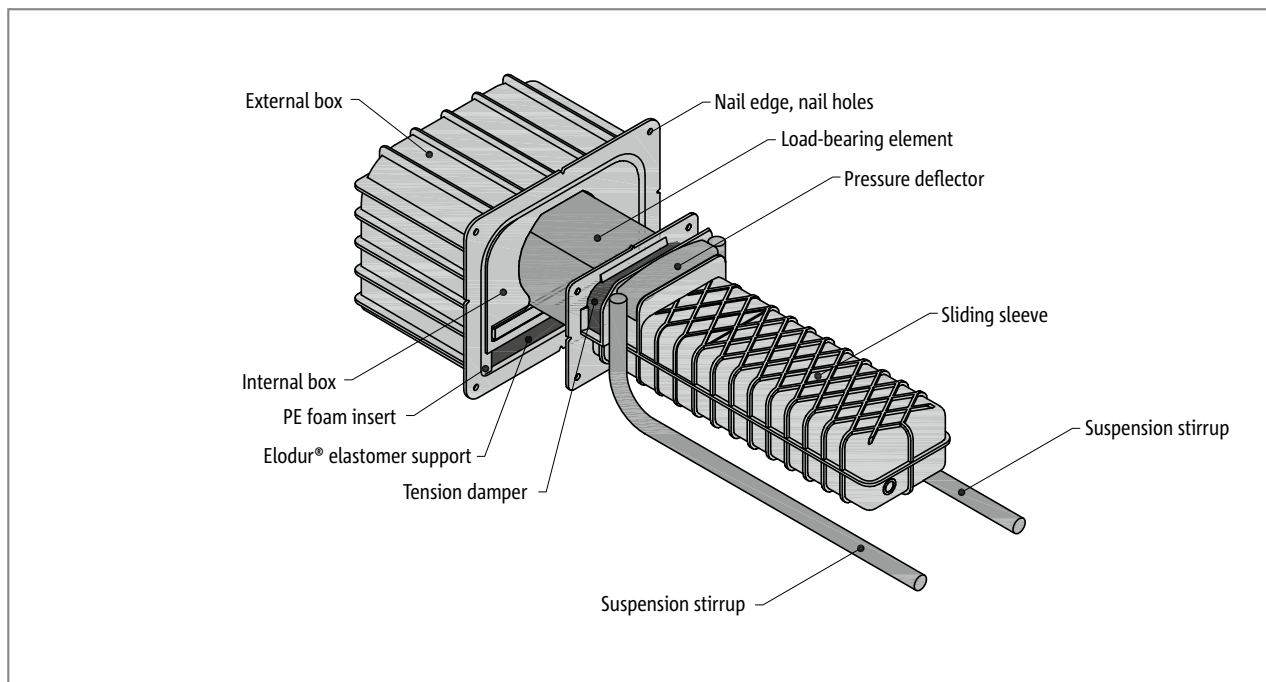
Schöck Tronsole® type Q: Wall component, load-bearing component and sliding sleeve with detailed components
